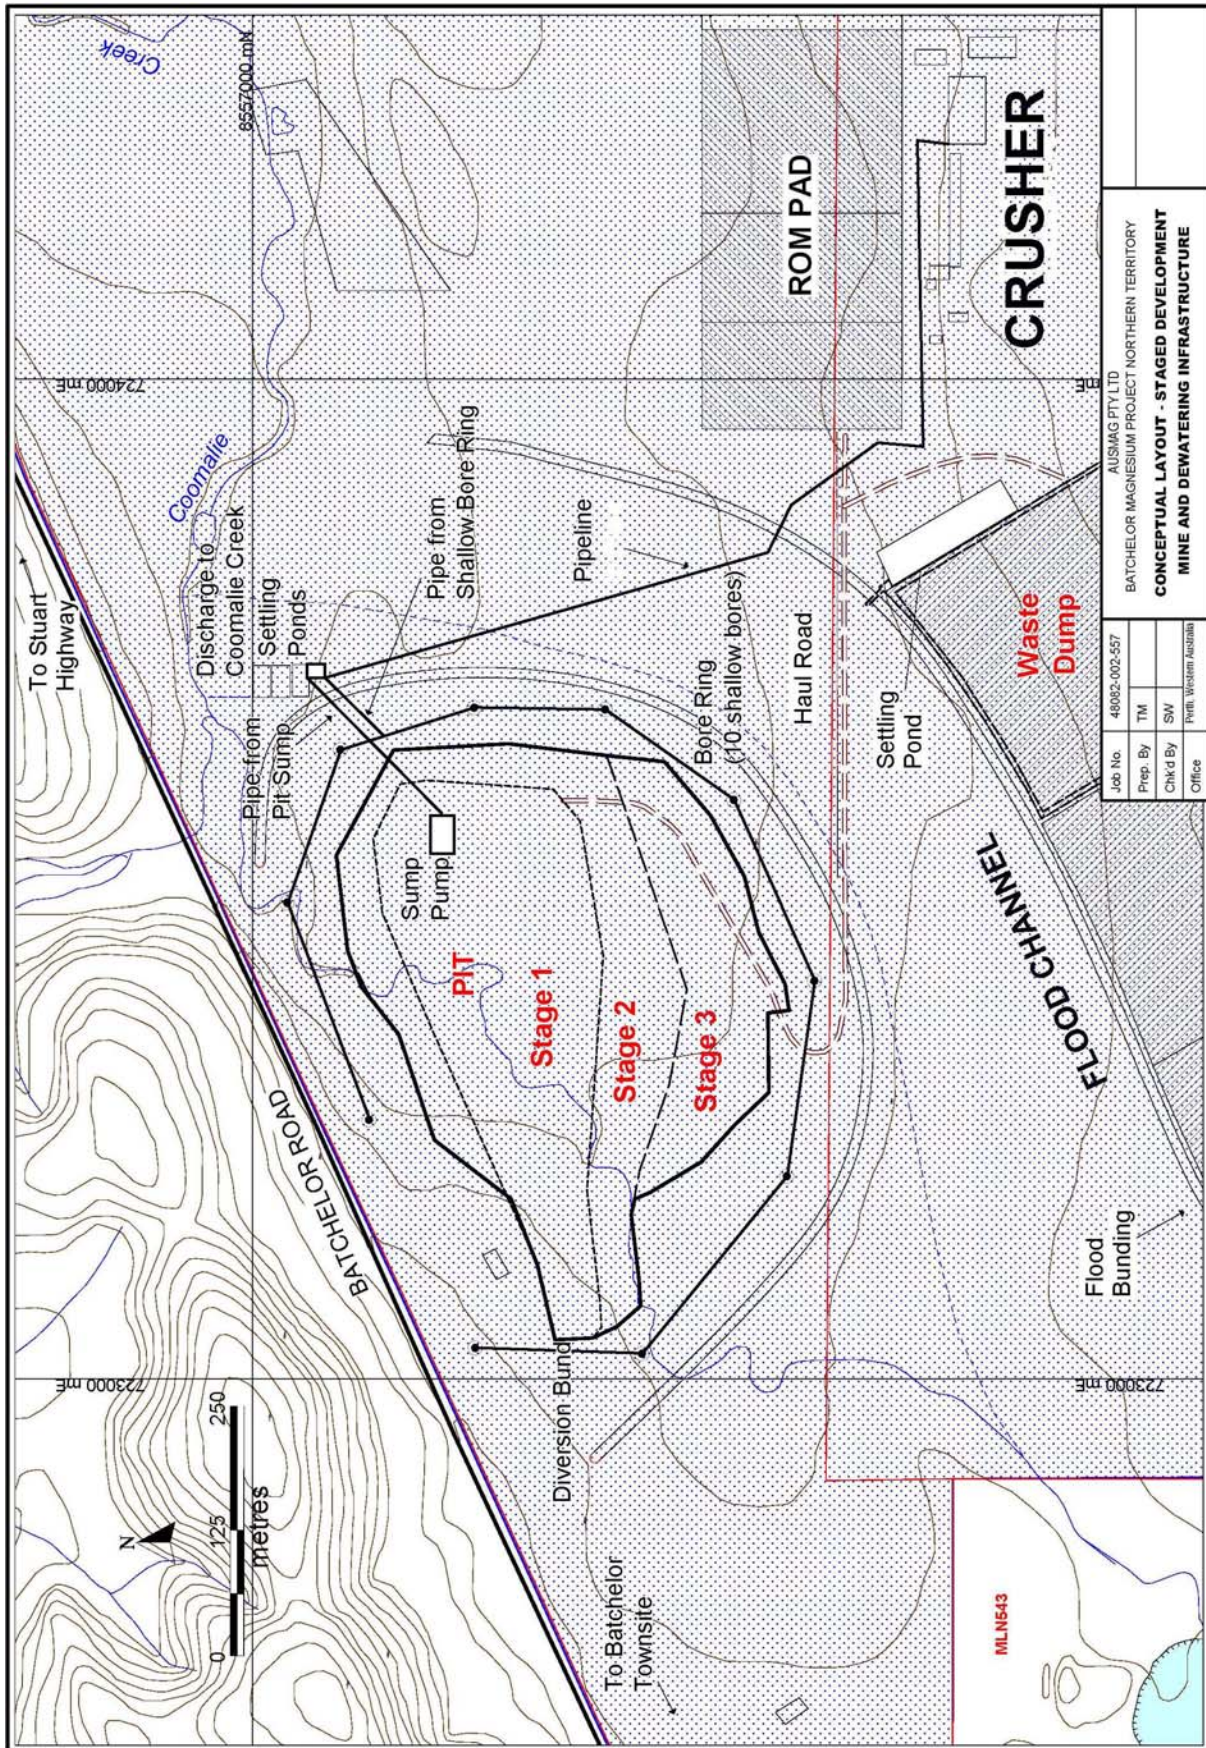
Dewatering Infrastructure - Bench by Bench Development
